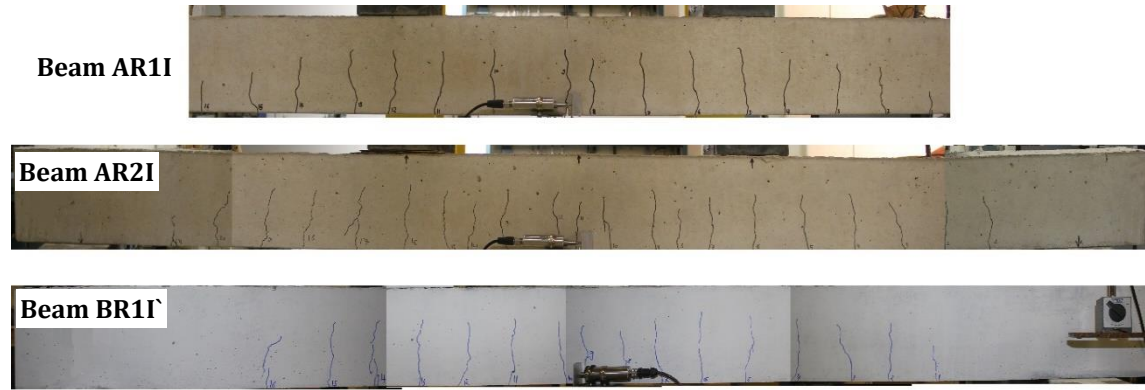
Crack patterns of the un-strengthened beams subjected to two loading/unloading cycles.
